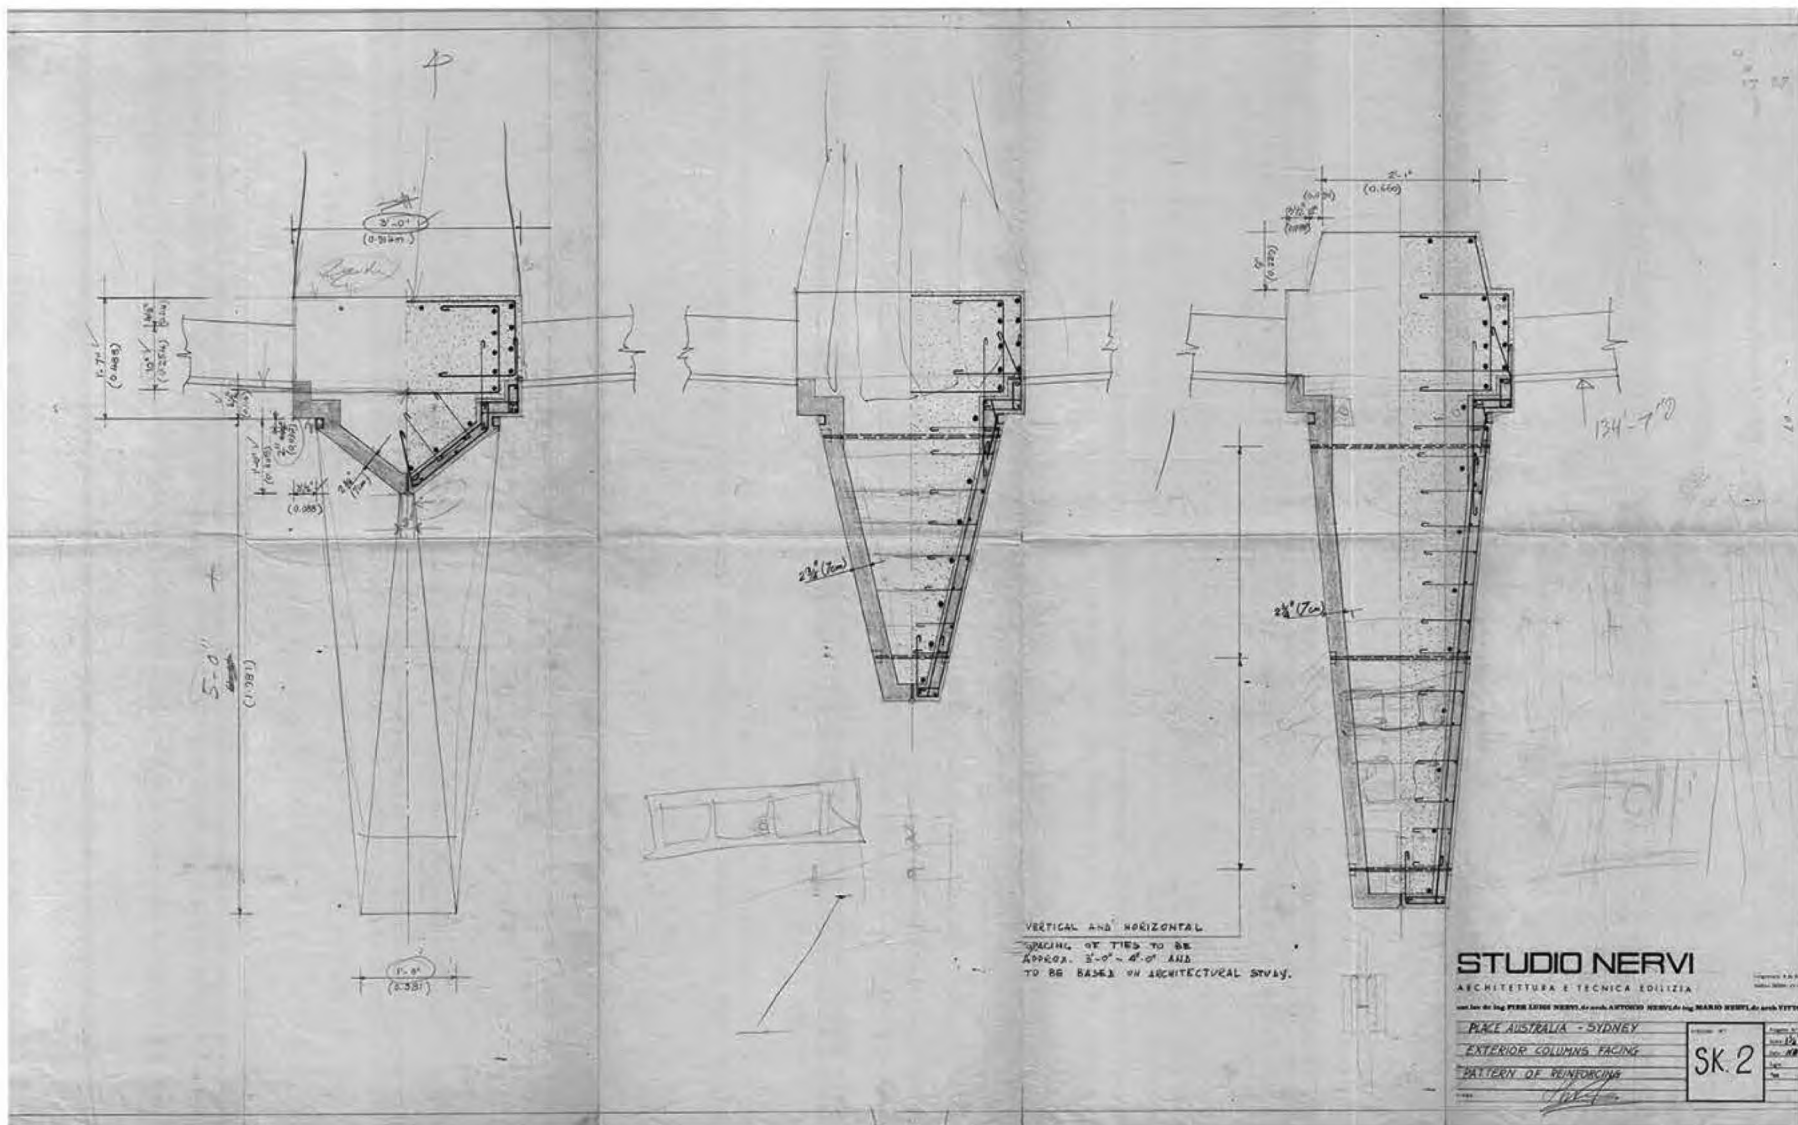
SK.2 - Detail of external facings showing reinforcing, Studio Nervi, Rome, 1963. (John Stigter Archive.)
